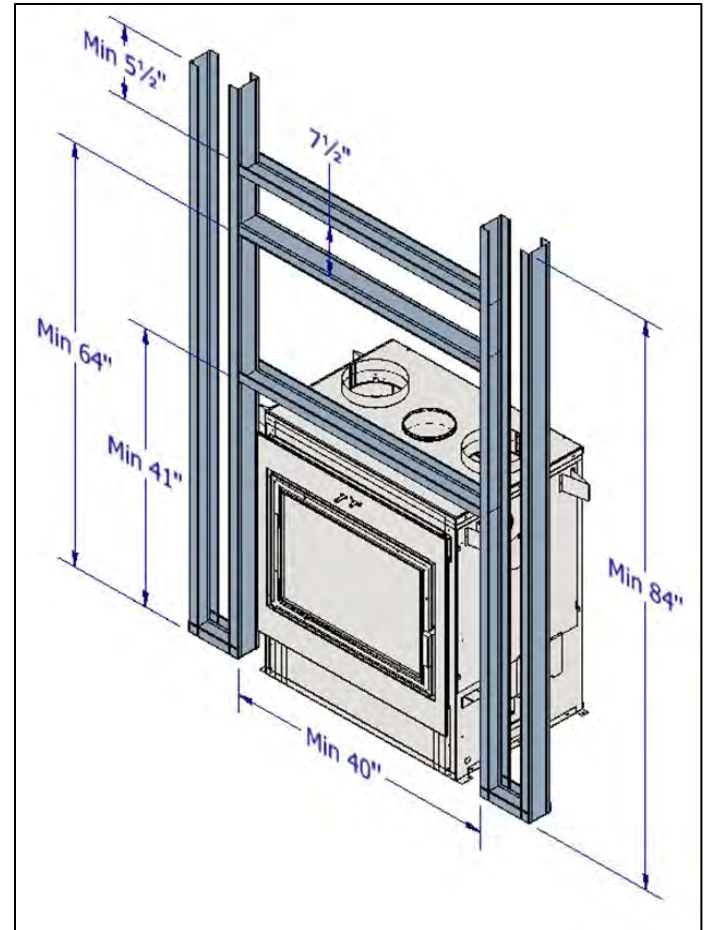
Minimum Framing Dimensions for Single Linear Front Louver Gravity Kit Installations
